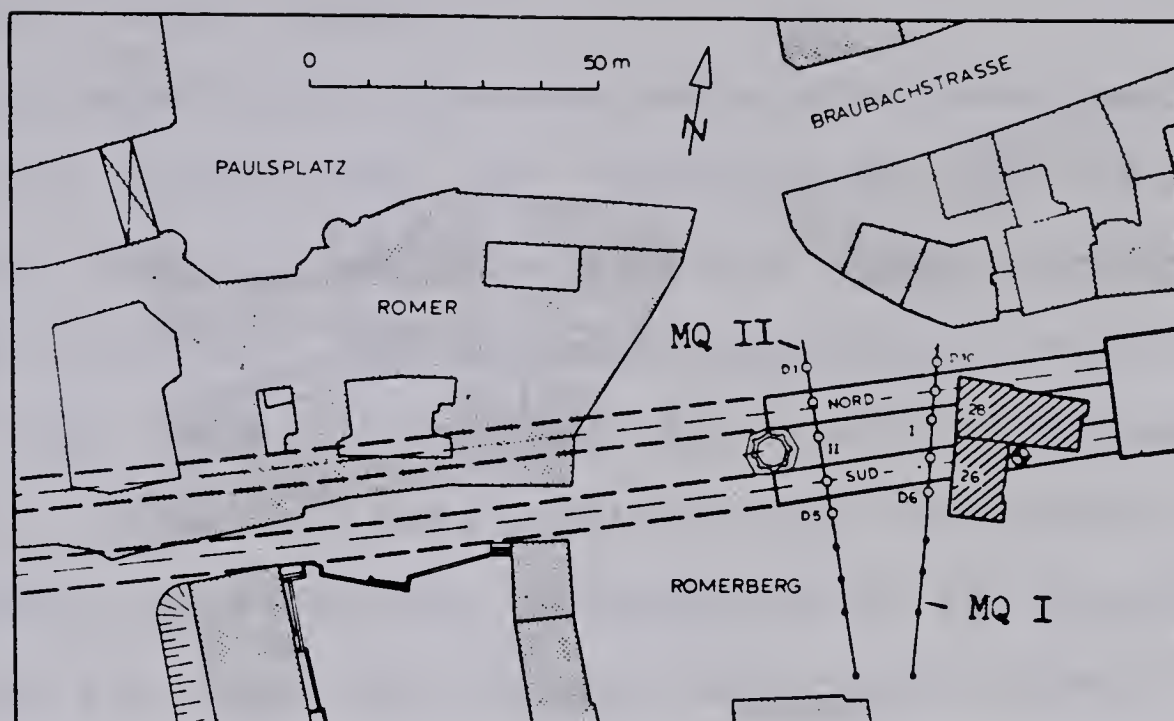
Plan view of Frankfurt Baulos 25 experimental section
